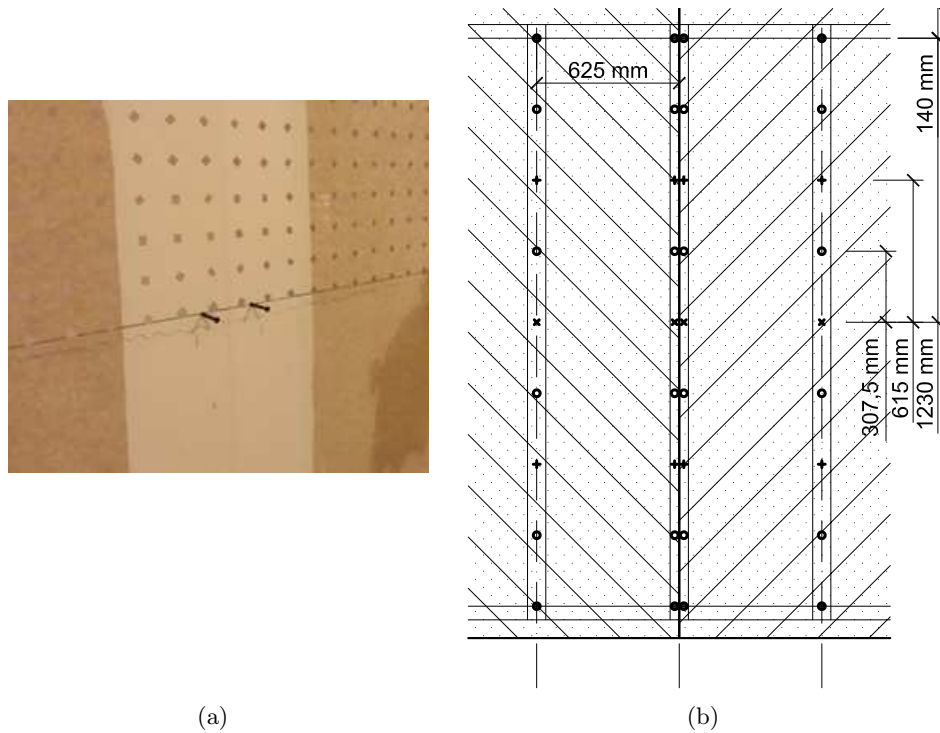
Arrangement of the screws. (a) Photograph of screws to be mounted; (b) mounting details of the gypsum fiber boards.
